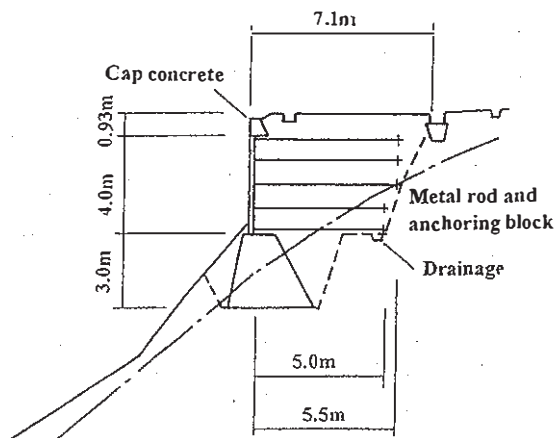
Cross-section of a multiple-anchor soil RW (MA in Fig. 3).
